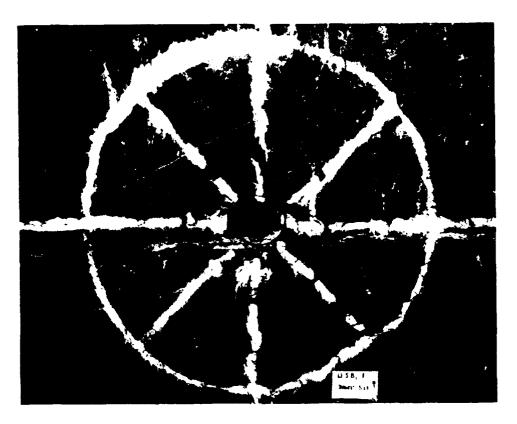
Instrumentation hole with counterbored recess. (Note the termination of blasting holes on the final rock surface.)
